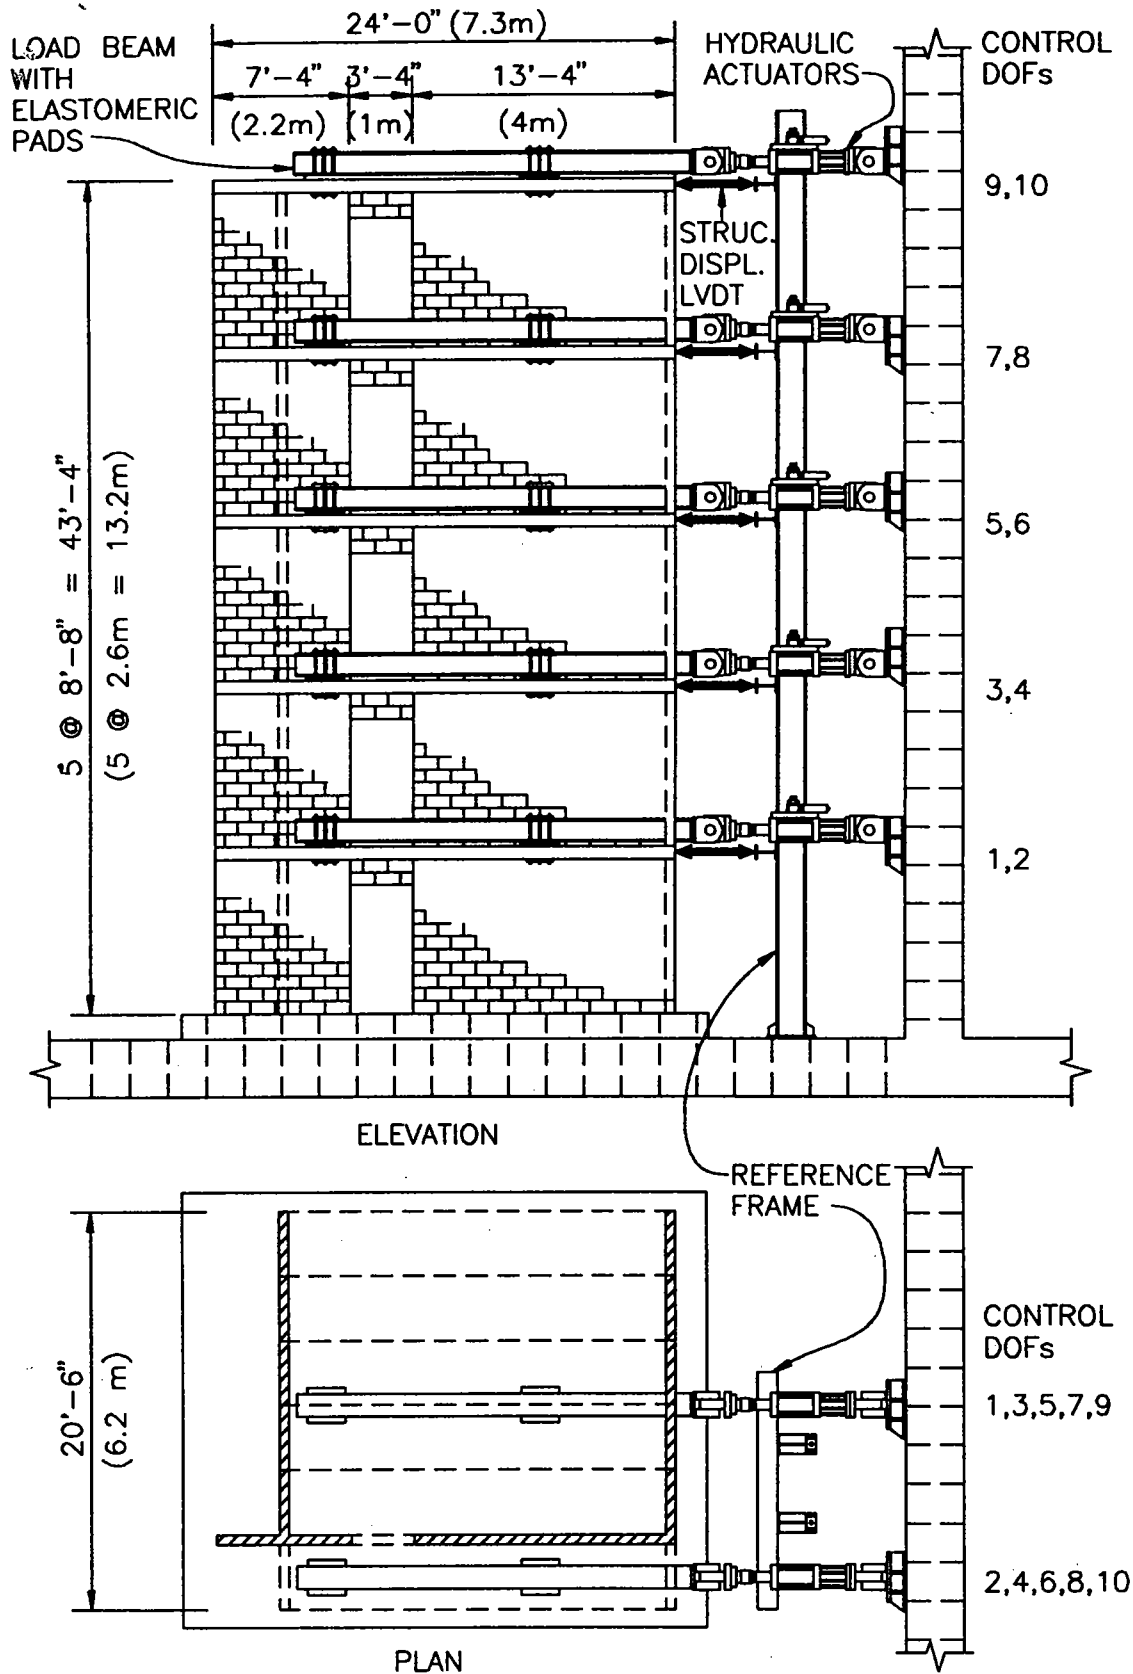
Plan and Elevation of the Research Building and Test Setup
